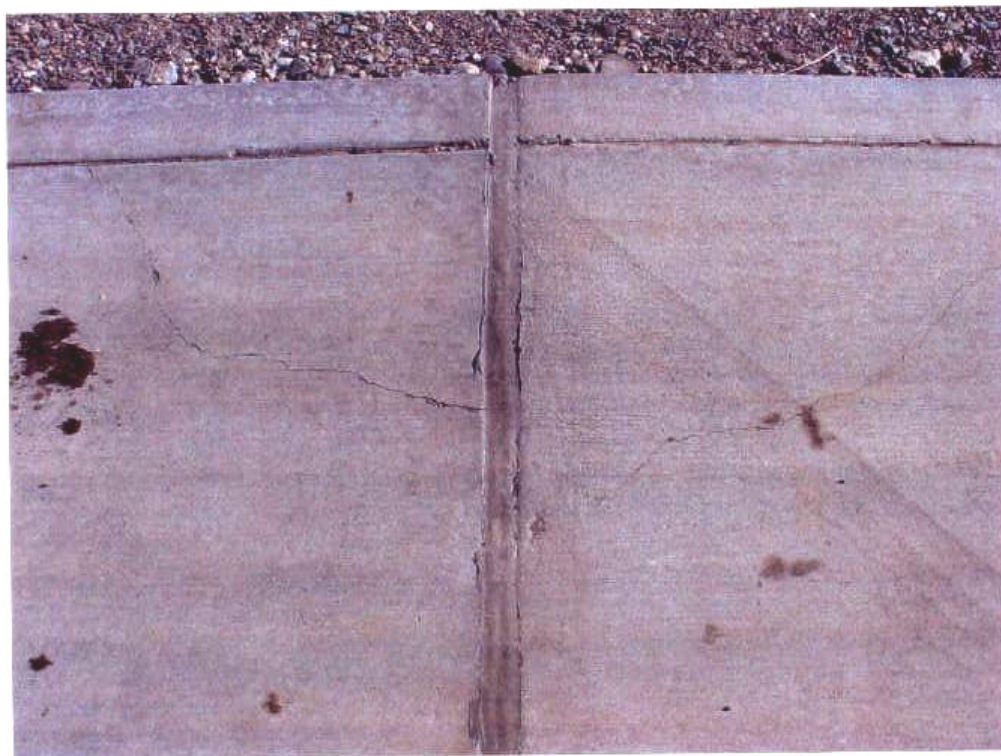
Hairline cracks in lined drainage ditch BS2.
